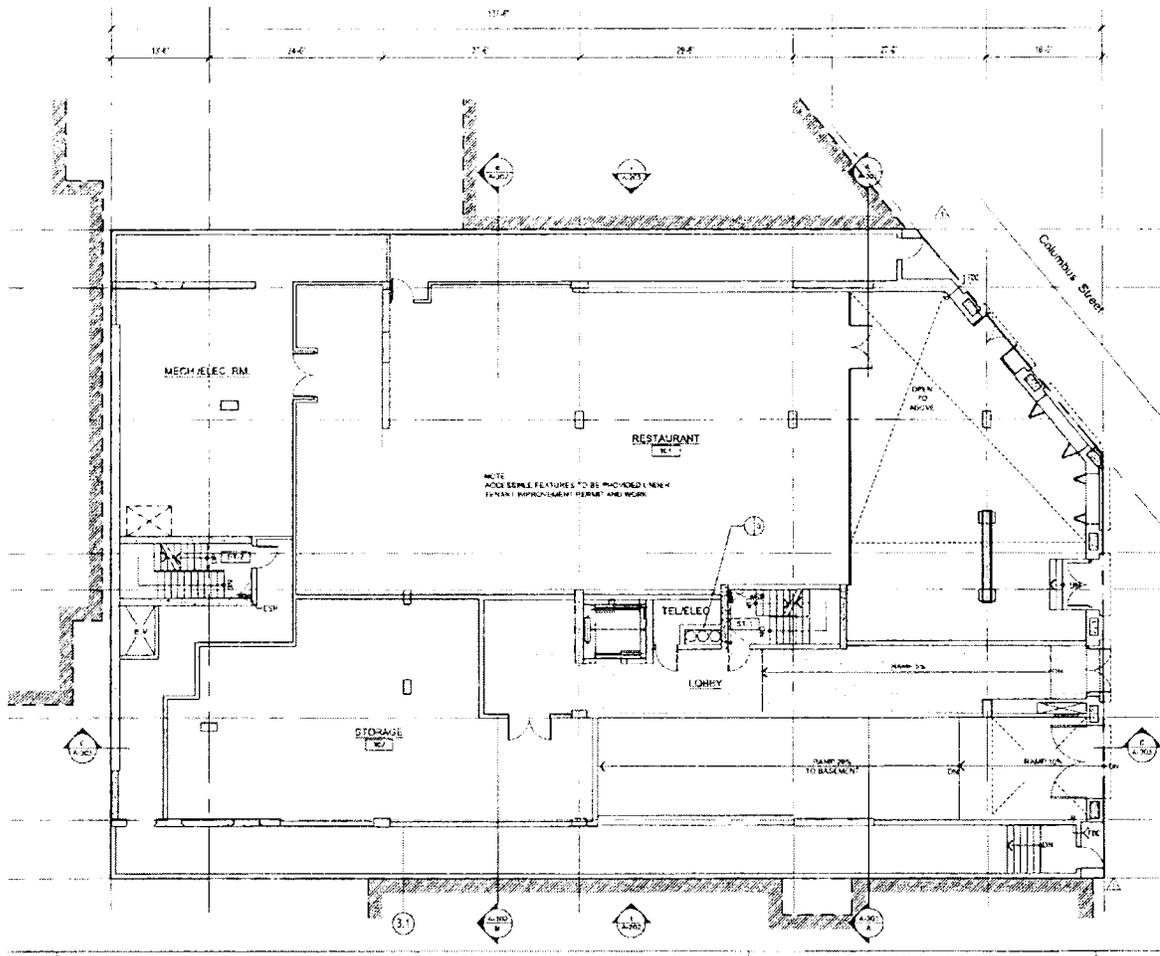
PROPOSED 1731 POWELL ST GROUND FLOOR PLAN
